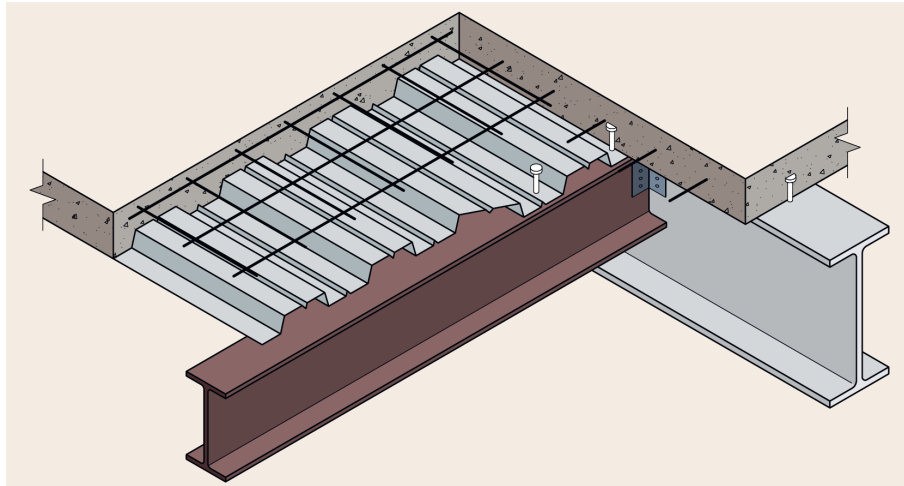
Cross section of composite steel deck floor (Simms and Hughes, 2011)
